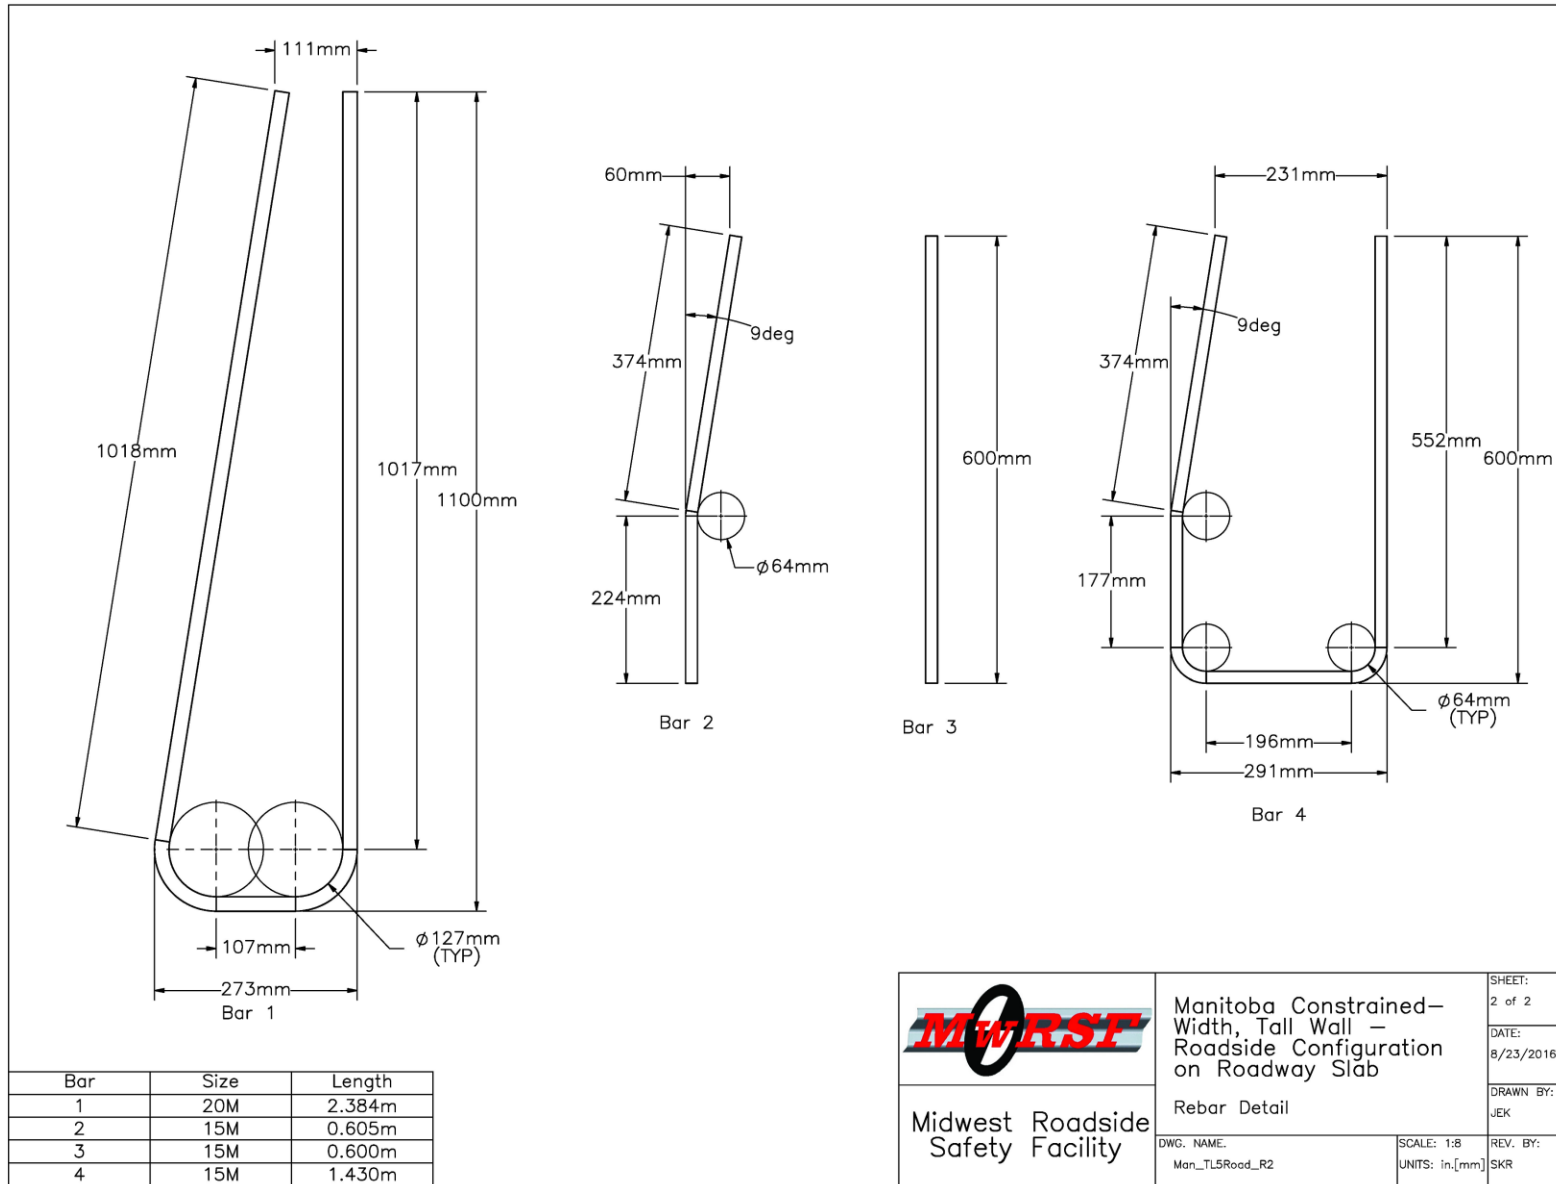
TL-5 Roadside Barrier Anchorage Bar Details
